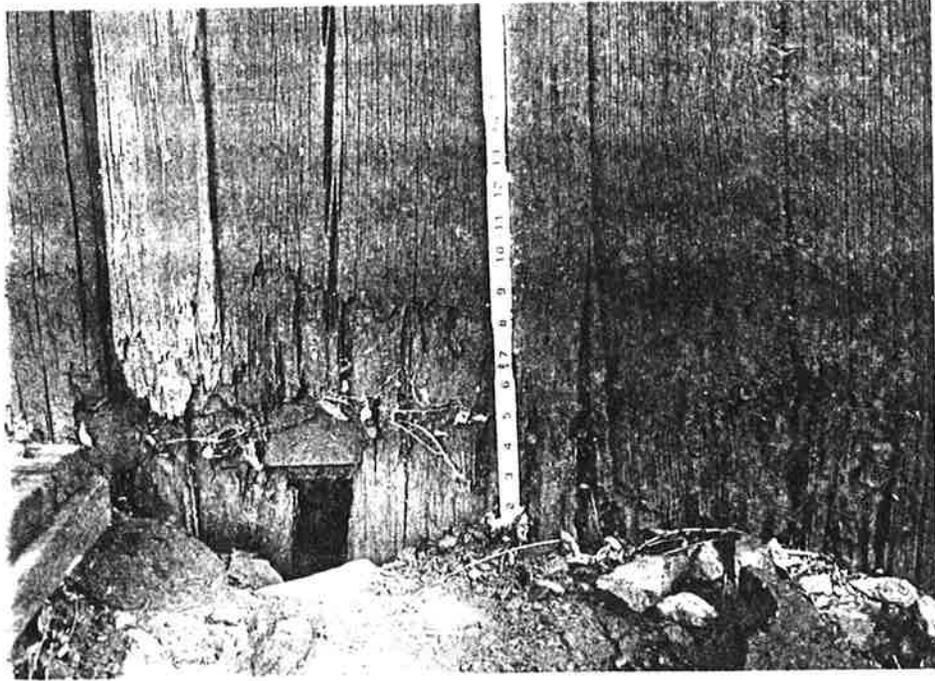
Birch Creek bunkhouse/shop, south side. Soil in direct contact with wood causes damage to the siding and sill by retaining moisture during wet months. (Neg. R3-8)
